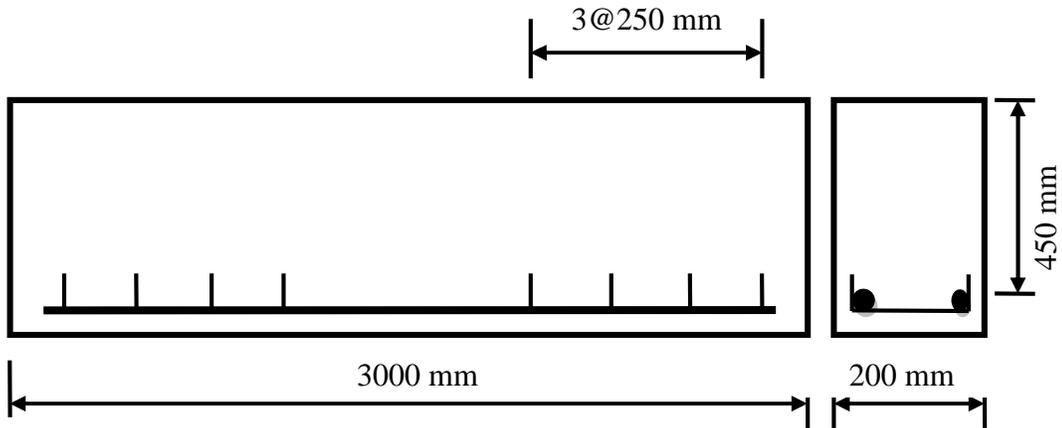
Longitudinal and Cross-Section of the Steel Reinforced Concrete Beam
